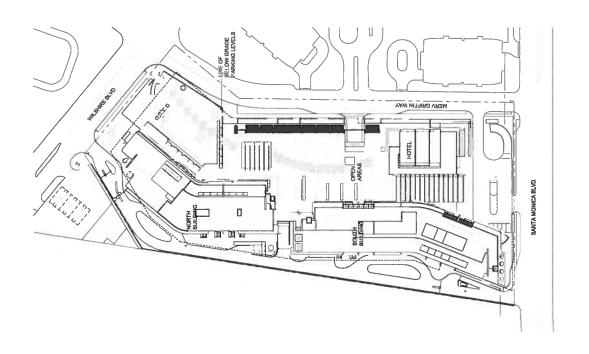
SPECIFIC PLAN AREA ONE BEVERLY HILLS
